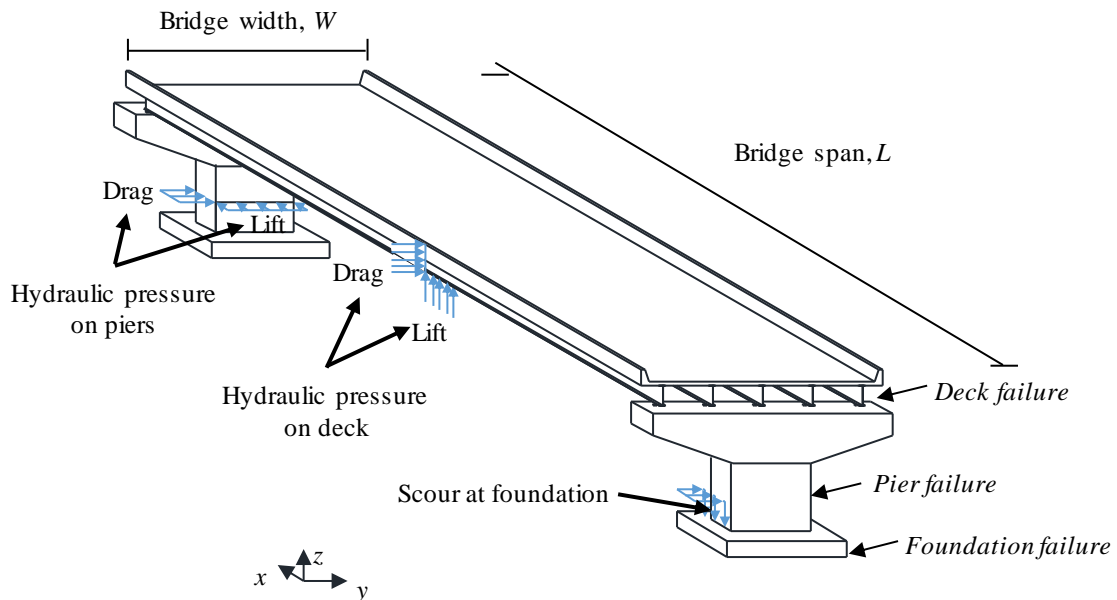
Hydraulic pressures on the bridge deck and pier and scour at the foundation of bridges over water may cause deck failure, pier failure, and/or foundation failure rendering the bridge impassable.
